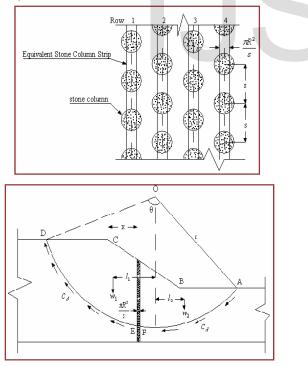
(a) Plan of grouped stone columns (Barksdale &Bachus, 1983); (b) Static slope stability analysis of homogeneous saturated clay ( $\Phi = 0$ ) reinforced with a row of column
